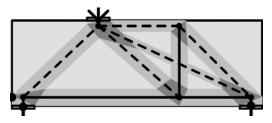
Layout of Proposed Load Transfer Mechanism based Strutand-Tie Model (Left side span: direct strut (a/d \approx 1); Right side span: Arch-Truss transition (a/d \approx 2))
